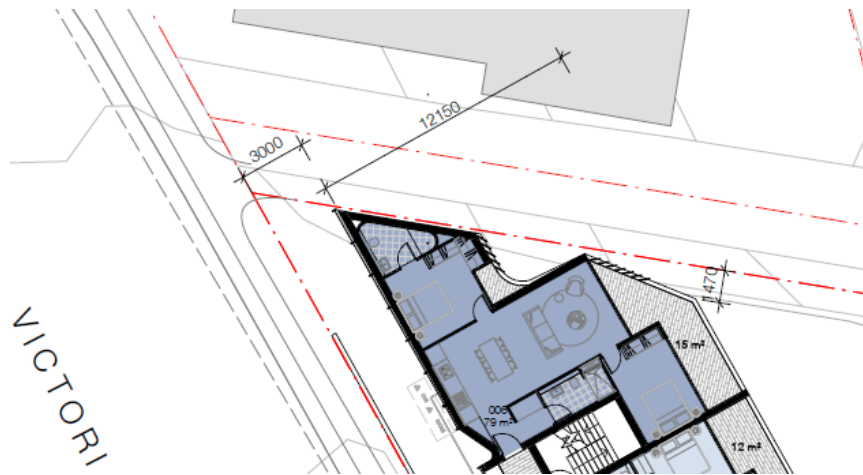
Ground level plan showing relationship to buildings on Belmore Lane
